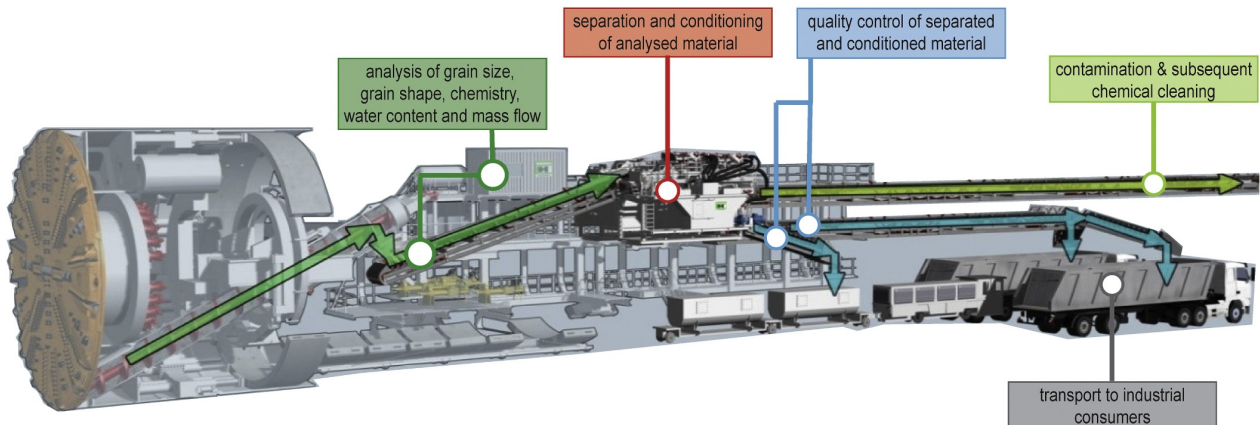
Schematic on-line analysis of excavated rock and soil material shown on a tunnel boring machine (TBM) for mechanical excavation.
